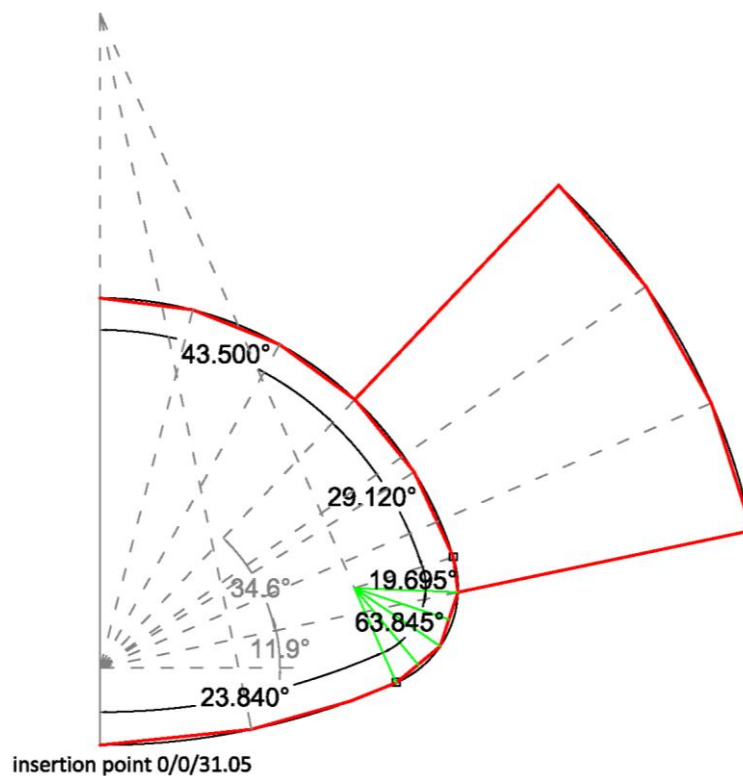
CROSS-SECTION OF THE TUNNEL
